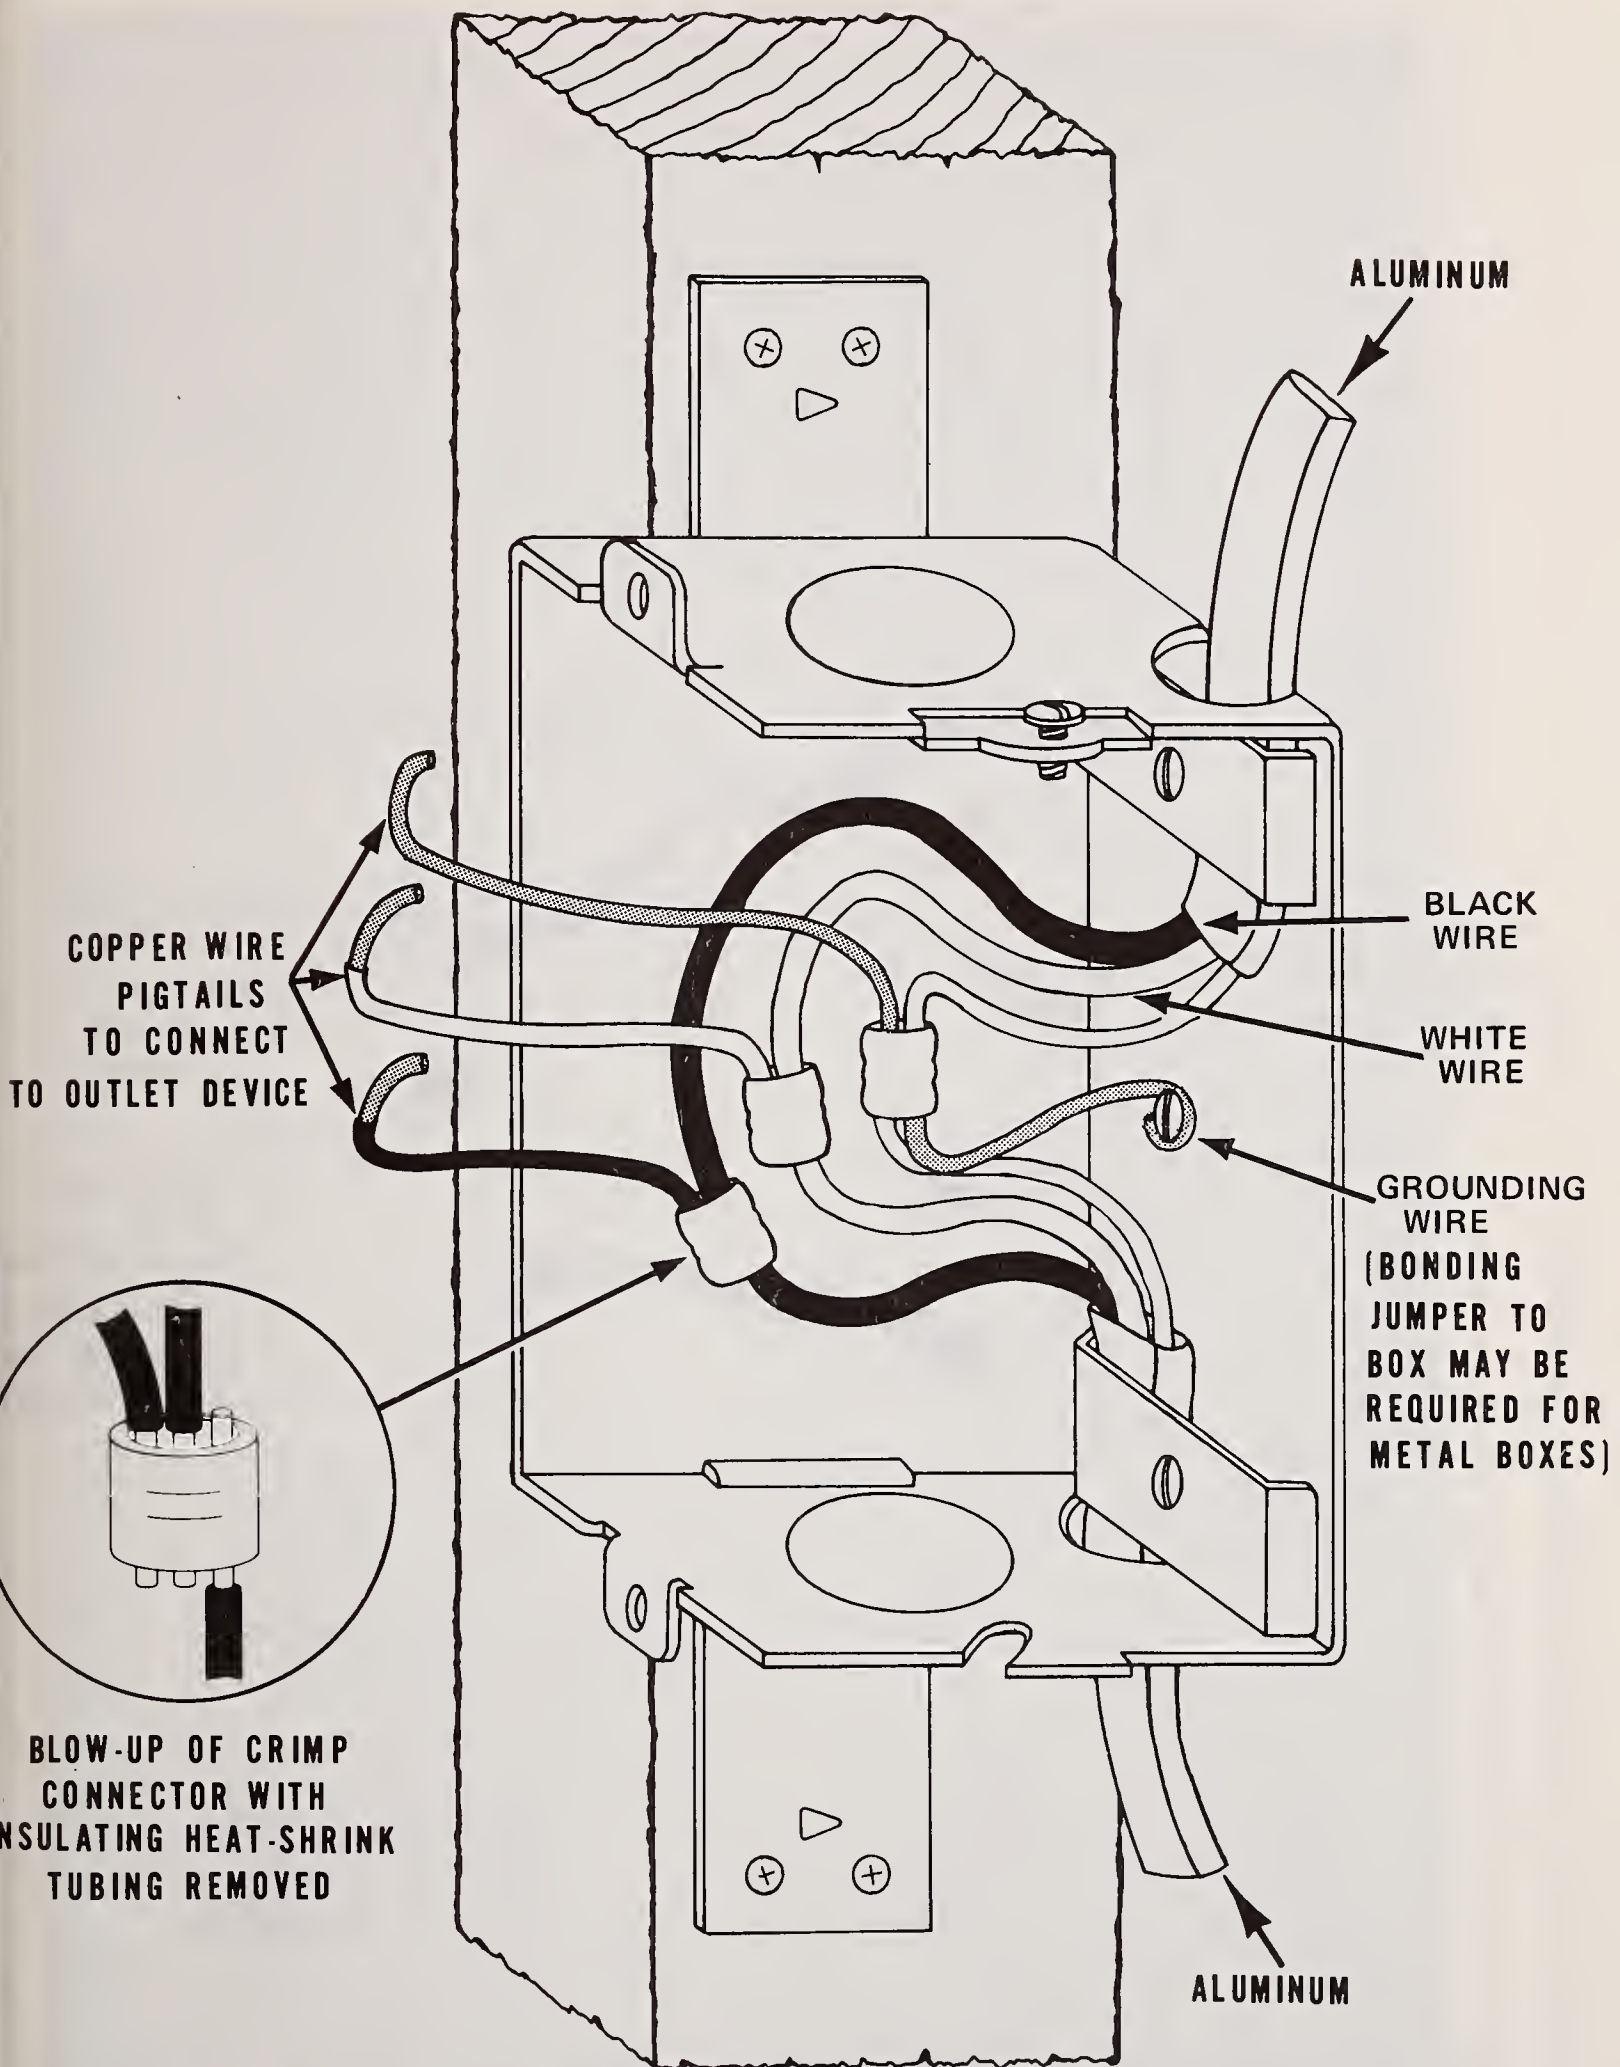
Splices used to connect aluminum wire to copper wire pigtails which are fastened under the binding screws of a wiring device.
